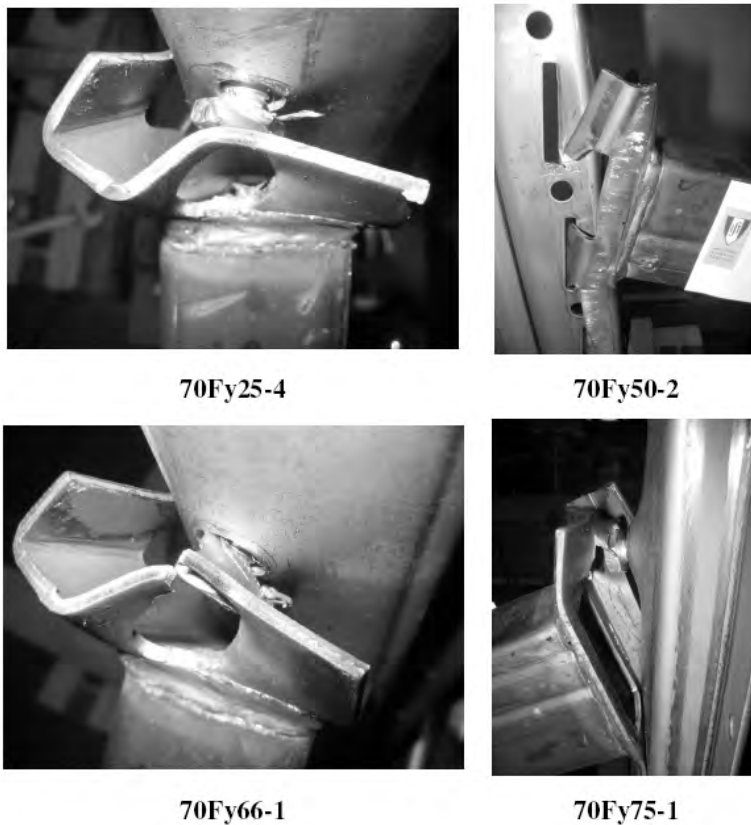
Cyclic tests on 70×45×1.5mm beam specimens – failure modes.
